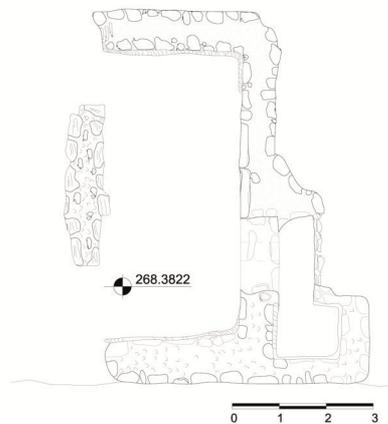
WP1, plan, drawing by H. Kepez (2013).
